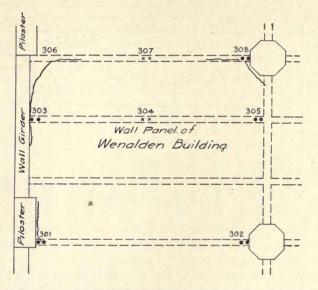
WALL PANEL TEST; PLAN SHOWING LOCATION OF GAUGE LINES.
